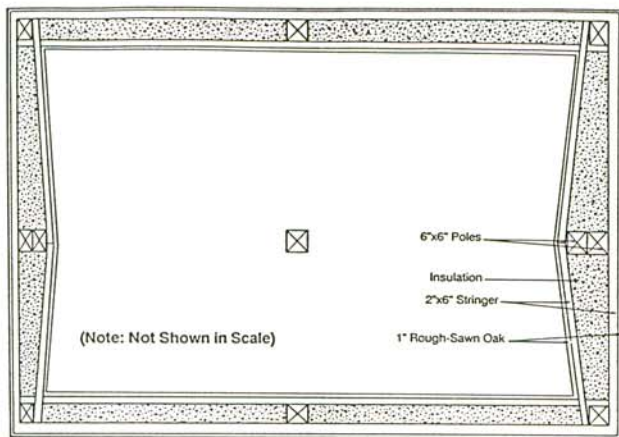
Angling of interior walls. Note an additional set of poles along the sidewall.
